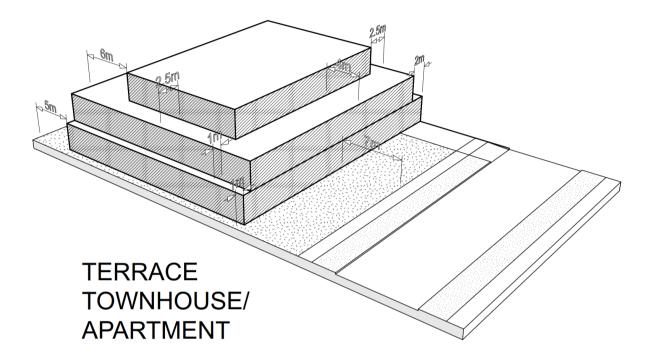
Diagram showing setback requirements for terrace townhouse/apartment type
